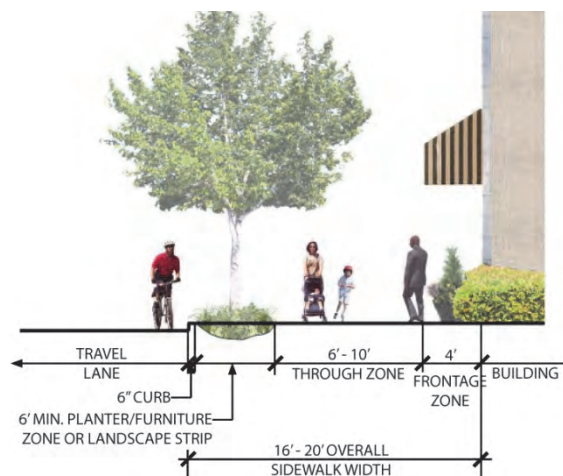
Sidewalk Zones in Mixed Use Areas
